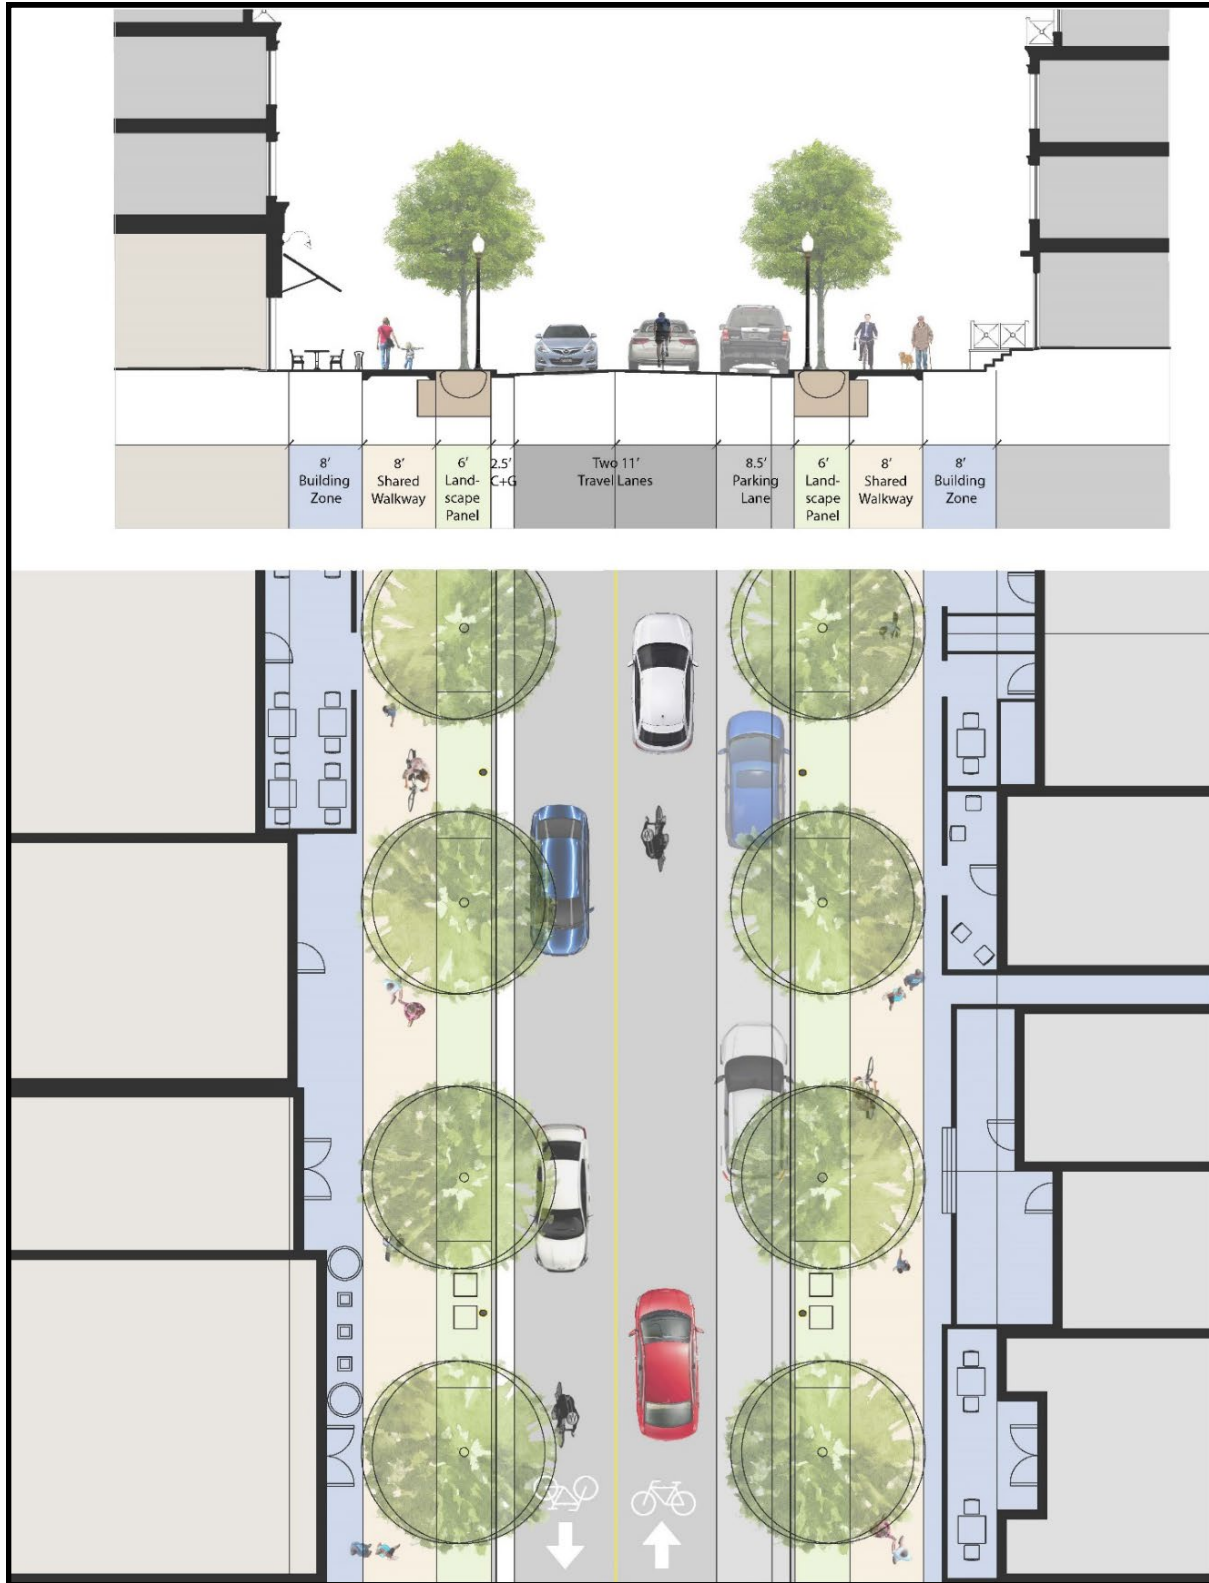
Beverly Road and Elm Street (Local Streets Type 1) cross-section
